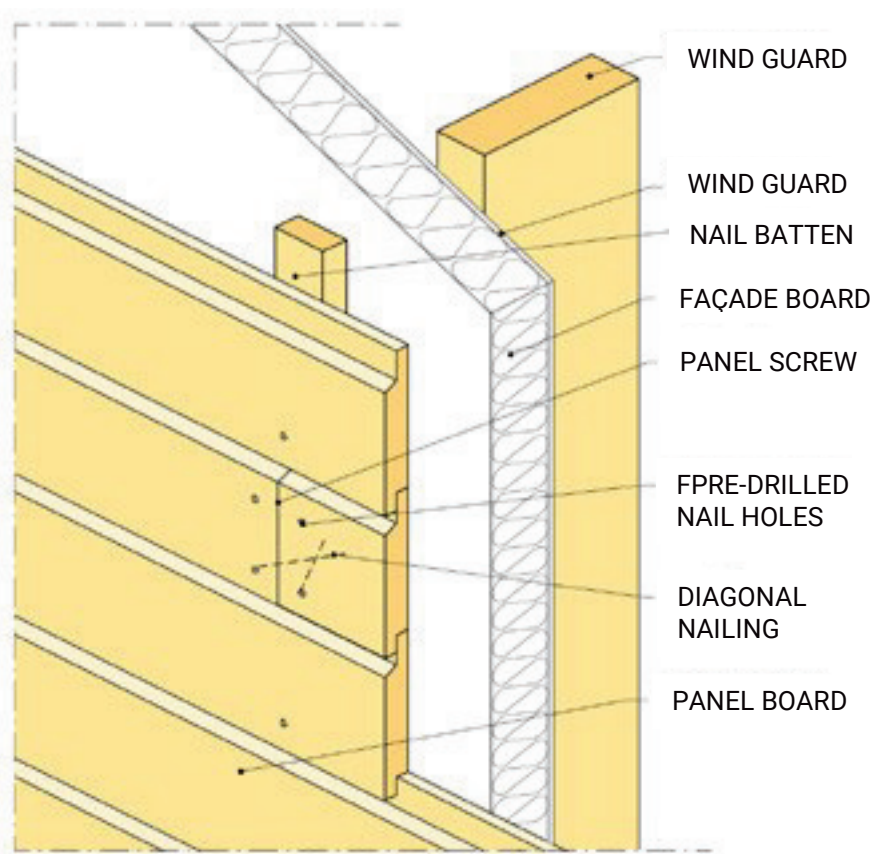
Joints should be avoided. Horizontal panel boards can be joined by cutting boards at right angles and fitting them flush with each other. Holes for nails or screws are pre-drilled and the boards are nailed or screwed diagonally into the underlying battens. Joints should be distributed evenly across the façade surface.
